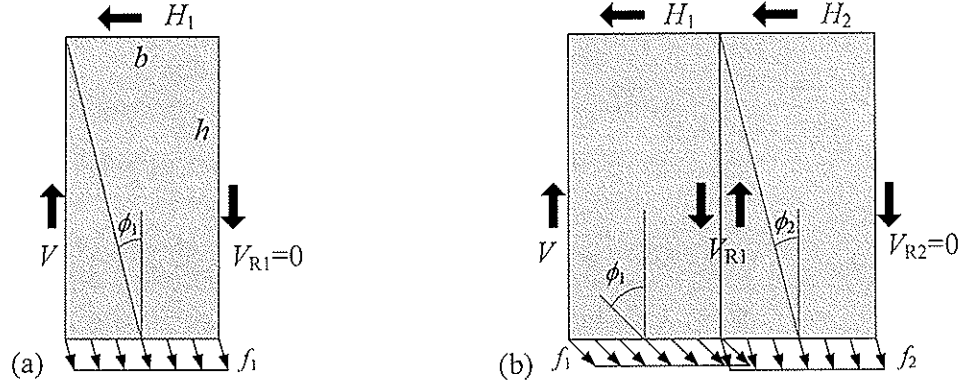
Plastic capacity of (a) a one segment and (b) a two segment transverse wall diaphragm in case of top rail fixed against horizontal displacement.
